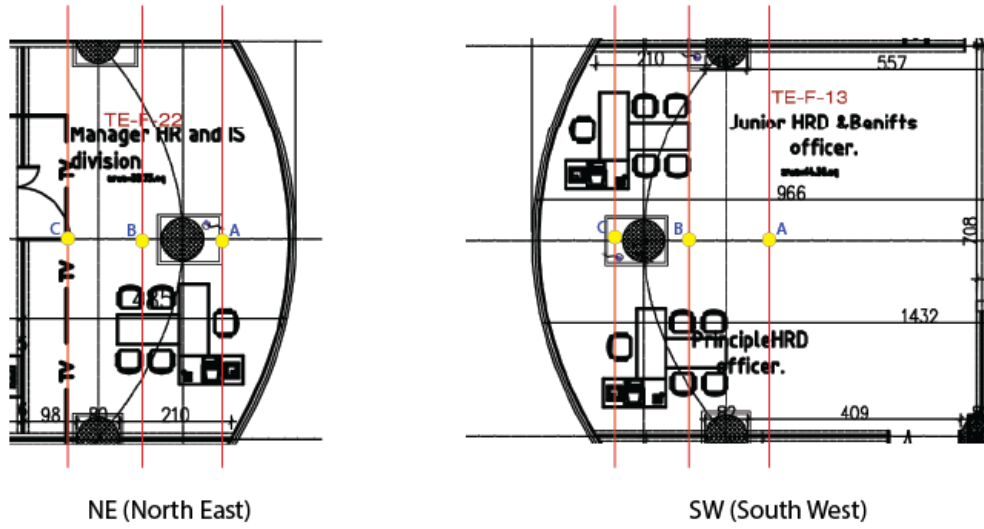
Floor Plan Showing Grid Points in North-East and South-West Orientations
